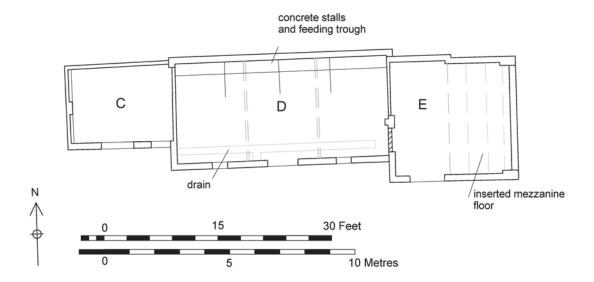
Floor plan of Buildings C-E (derived from plan supplied by client).
